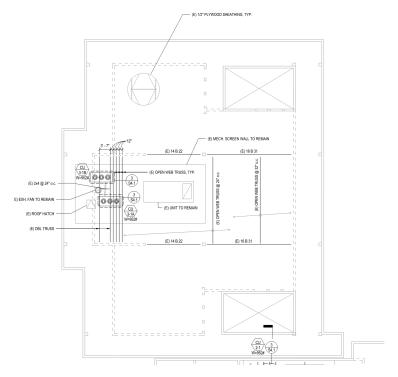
BUILDING 3: 2017 HVAC Upgrade Roof Framing Plan
